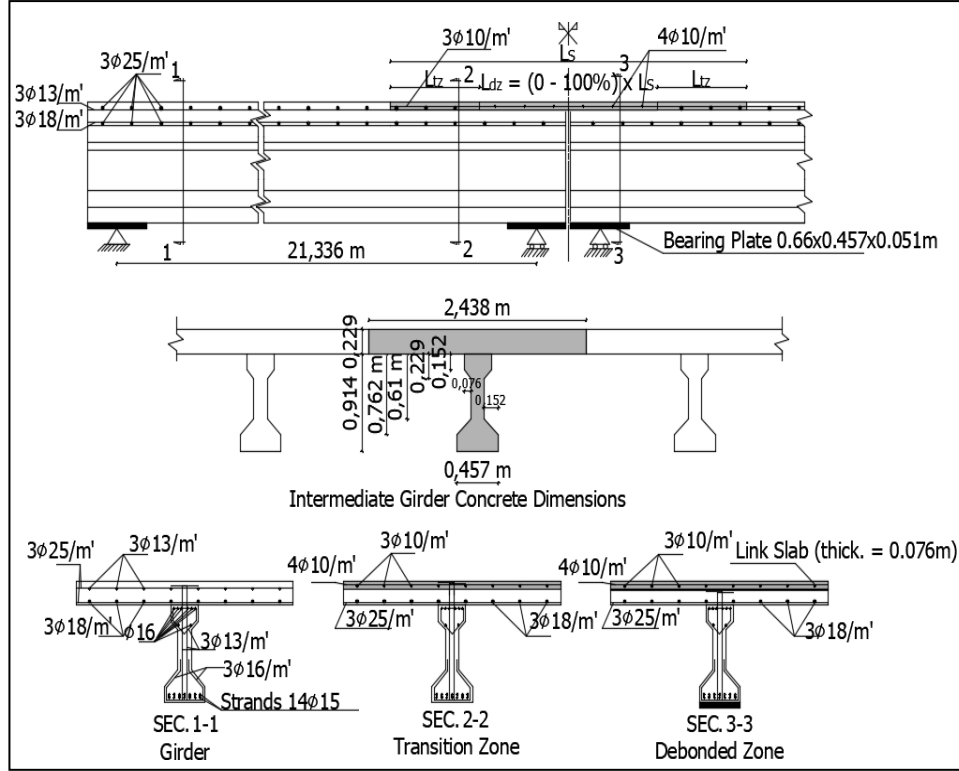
Girder with link slab concrete dimensions and reinforcement.
